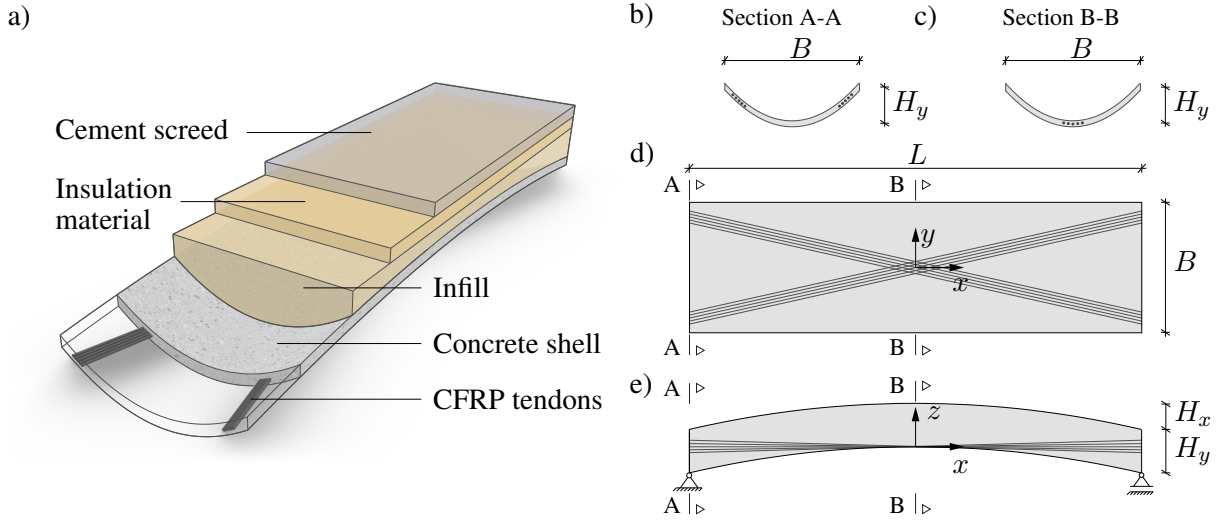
HP beam-like shell floor element: (a) rendering of HP floor element with its material layers, (b) cross-section at support and (c) at mid span, (d) top view and (e) side view
